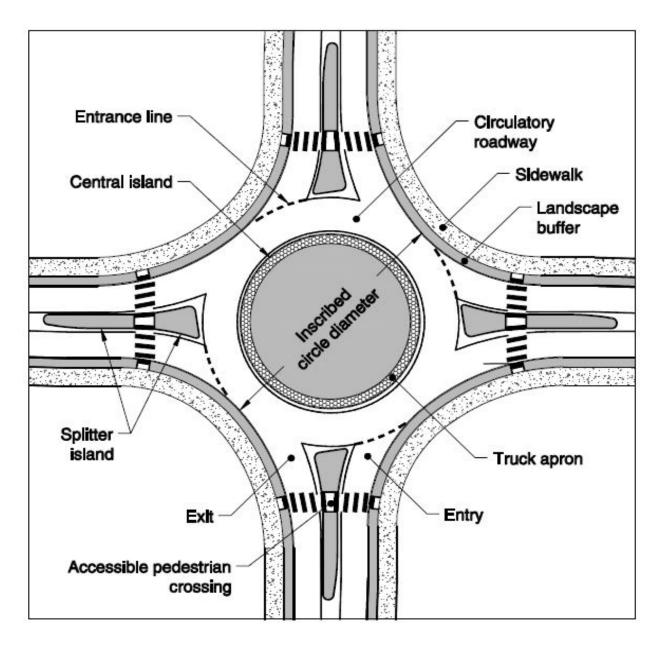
ROUNDABOUT DESIGN ELEMENTS
